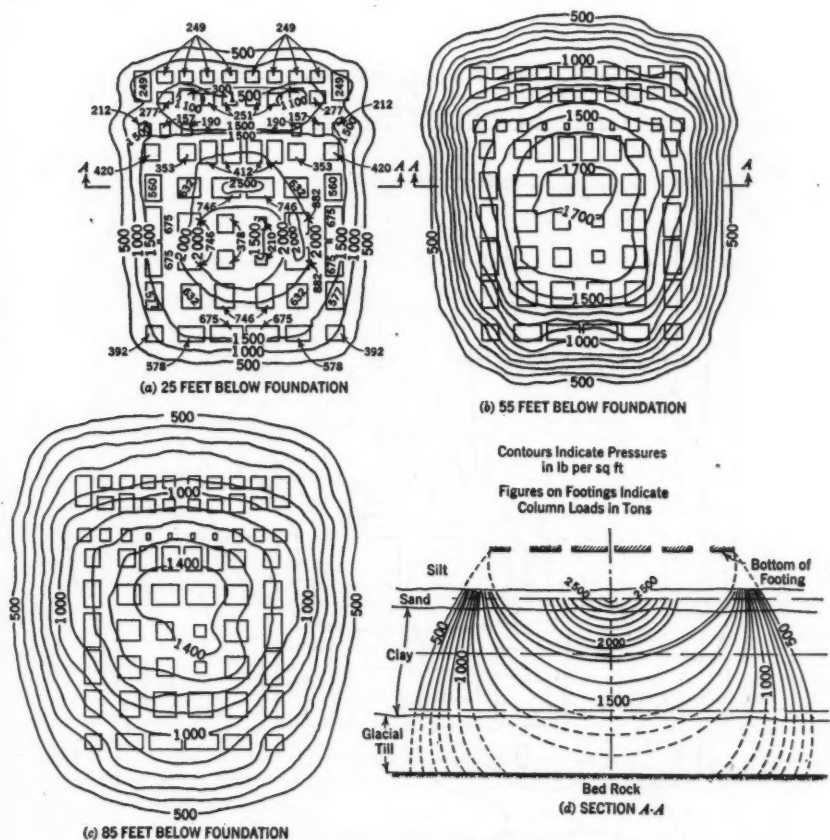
DISTRIBUTION OF STRESSES UNDER A TYPICAL BUILDING.
